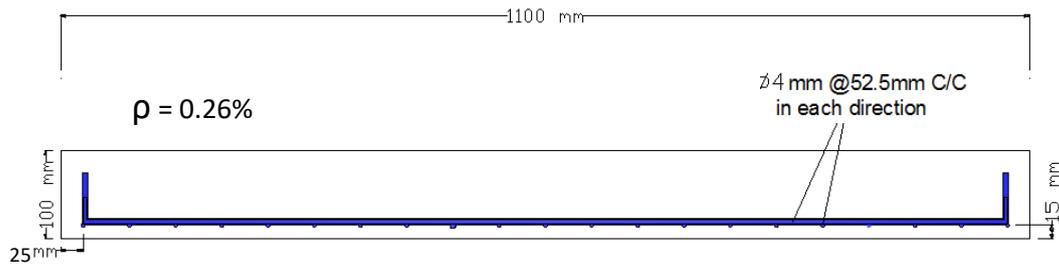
Main Reinforcement details for slabs of steel ratio (0.26%).
